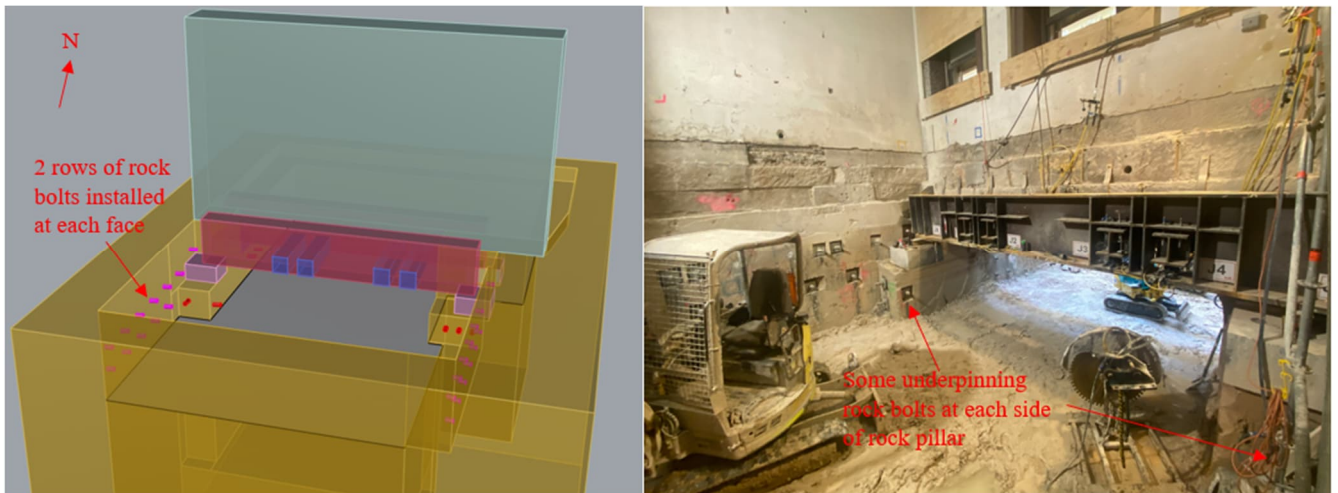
Wall breakthrough – 3D model isometric view (left) and site photography (right)
